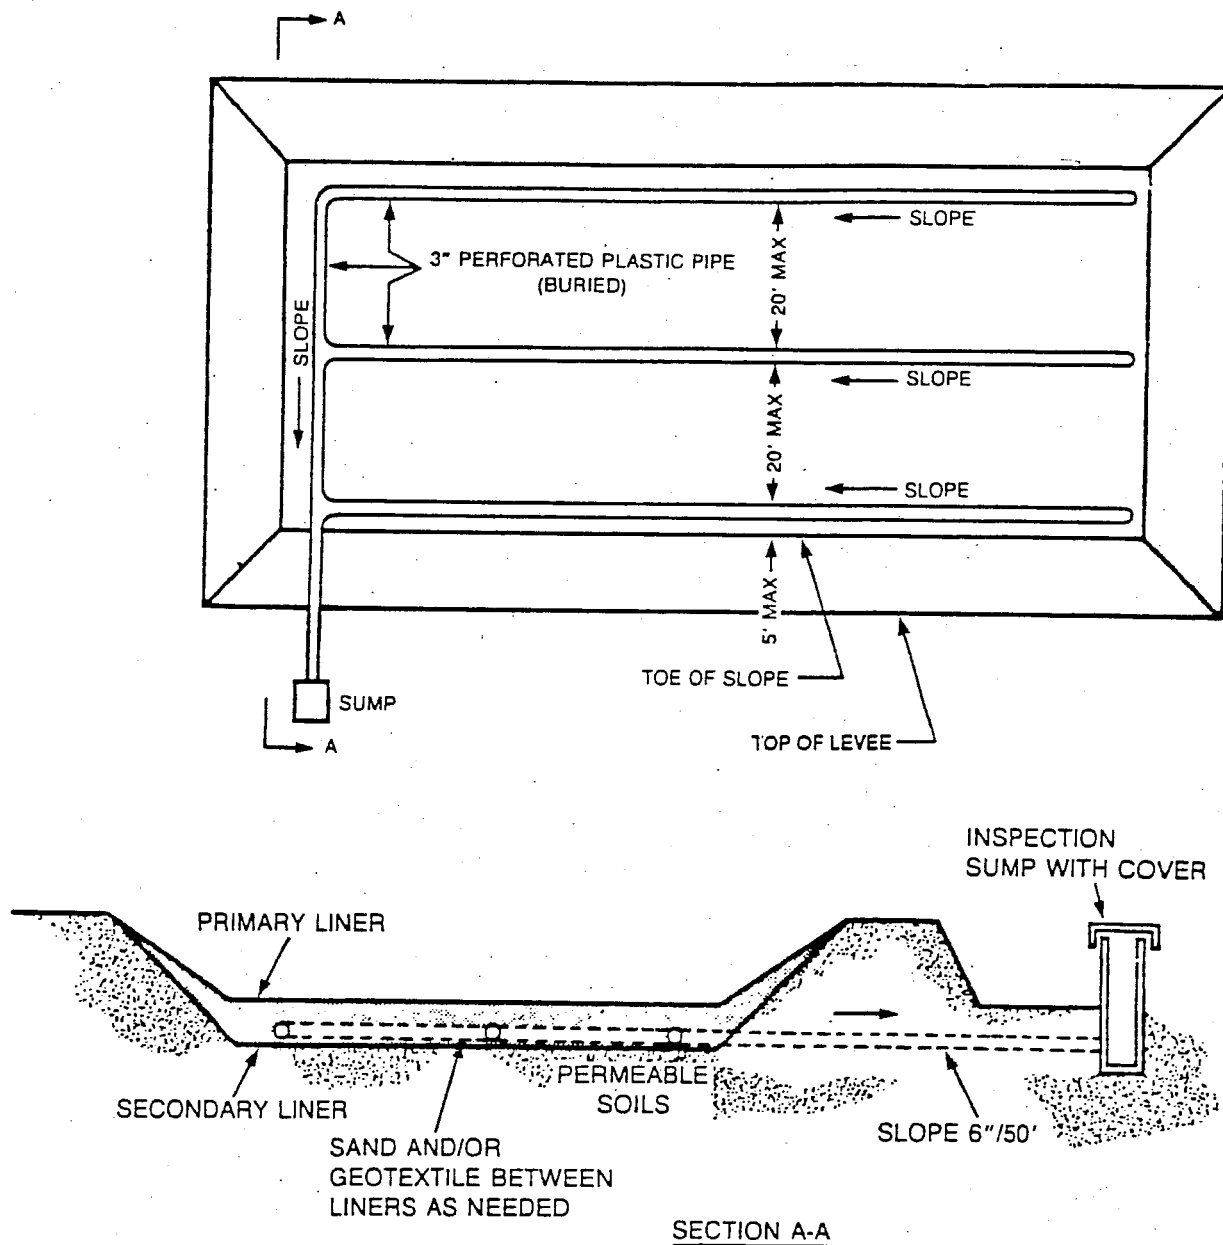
EXAMPLE OF A LEAK DETECTION SYSTEM FOR A LINED PIT CONSTRUCTED IN PERMEABLE SOILS.
